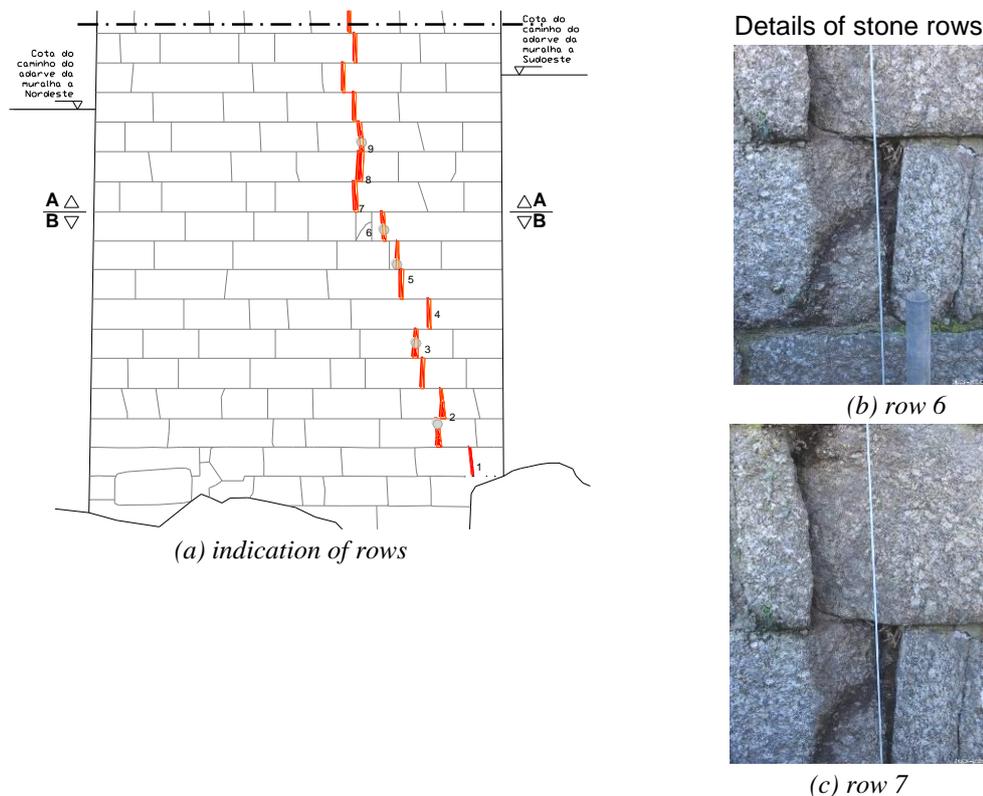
Geometrical survey of the cracks of the North façade of tower T1
